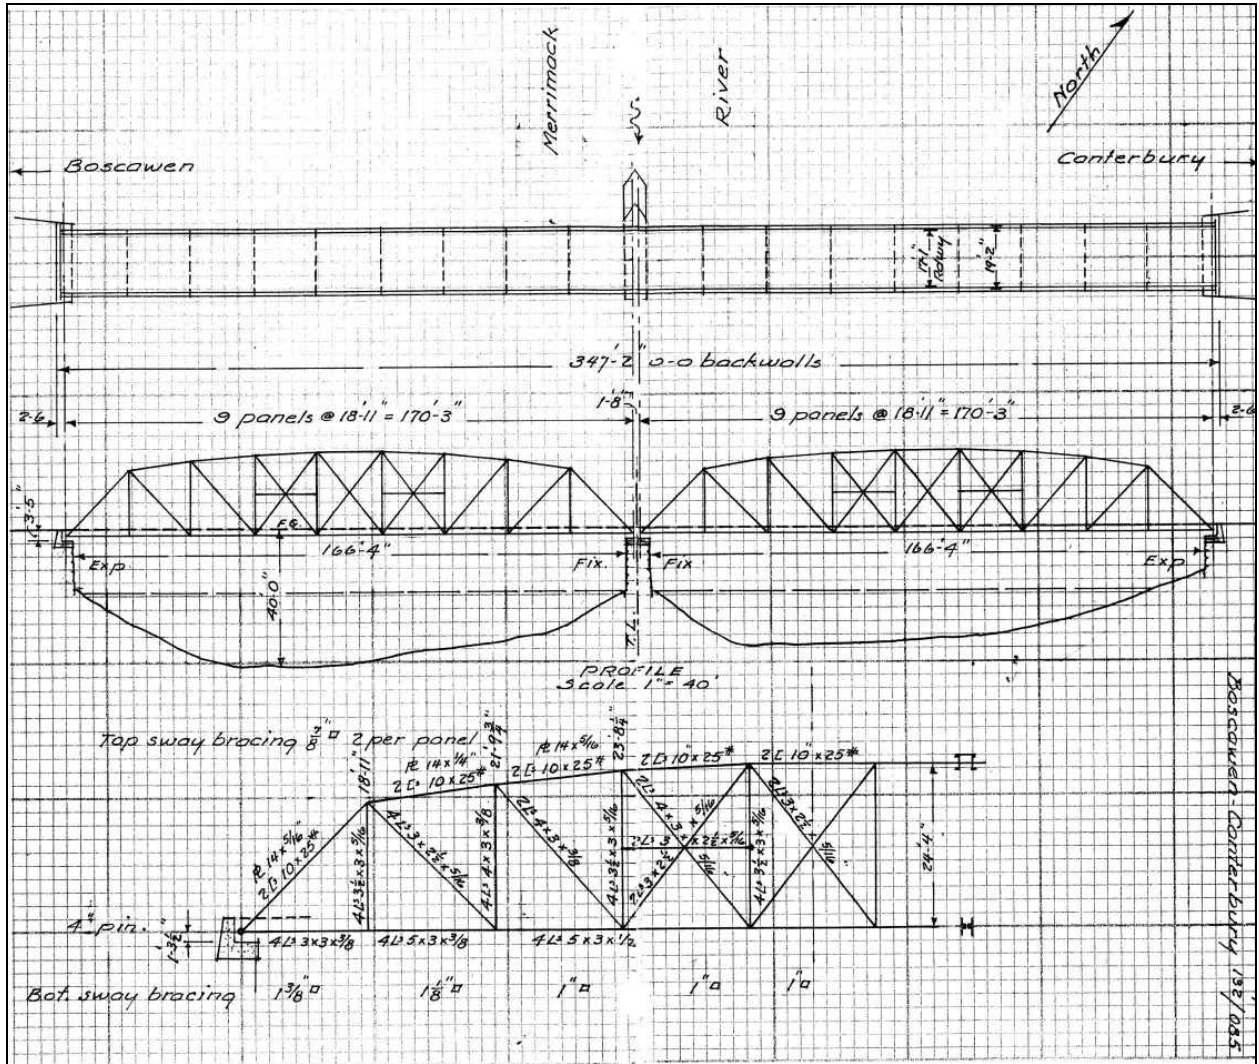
Bridge Plan and Profile sketch from NHHD Bridge Inventory Card (1940).
